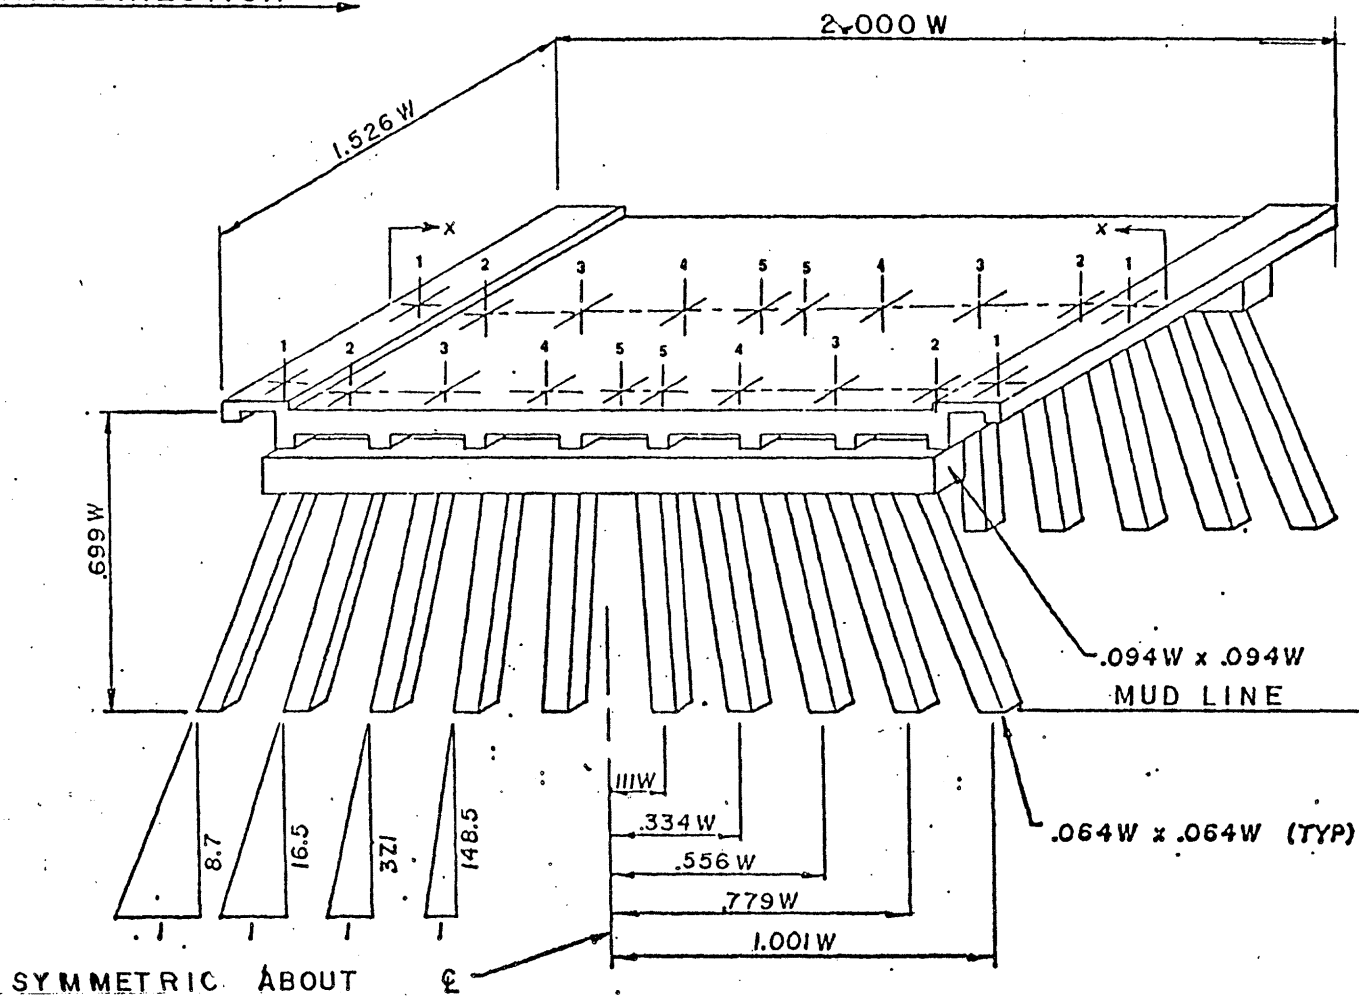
Isometric of Slab/Beam Bridge Model with Pressure Transducer Locations
